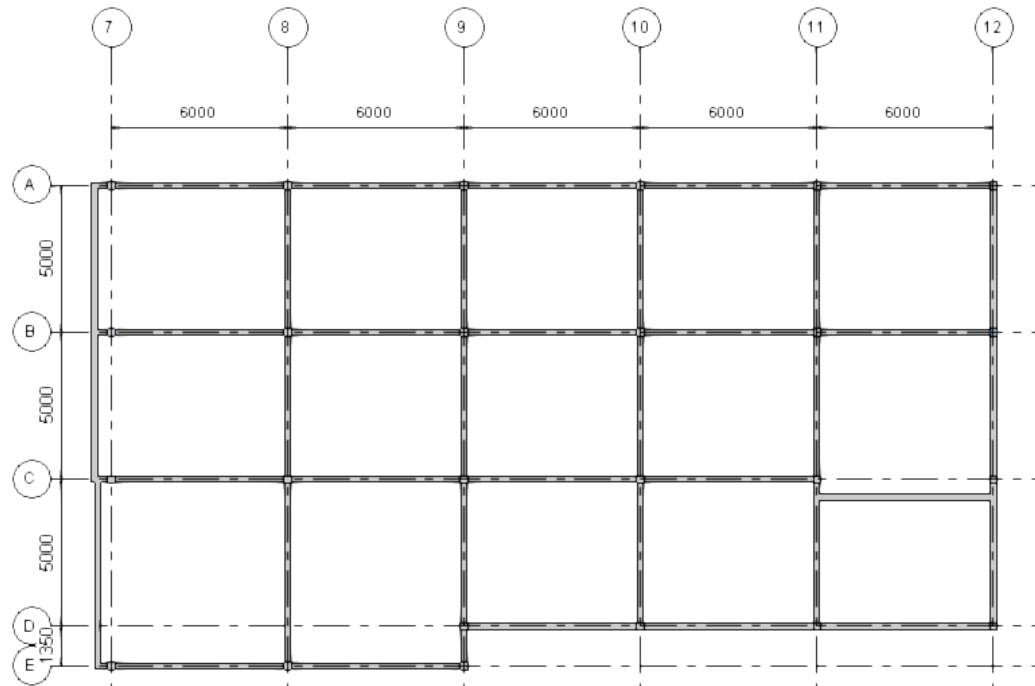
Typical Roof Floor Beam Layout
